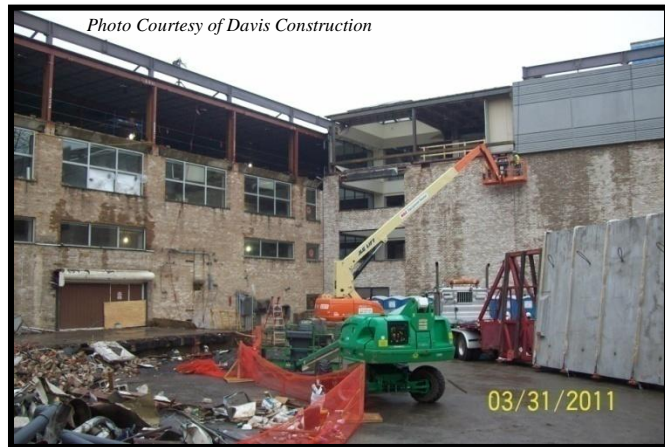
| Demolition of Existing Parapet for Perimeter of Main Building
